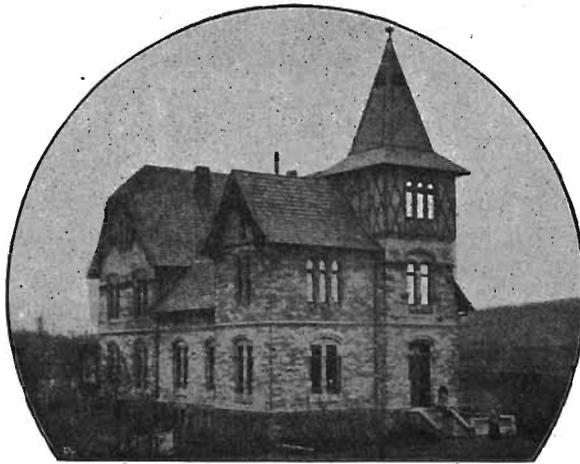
Modern German building in which hydraulic gypsum was used for floors and as mortar for walls. After Von Waldegg.
